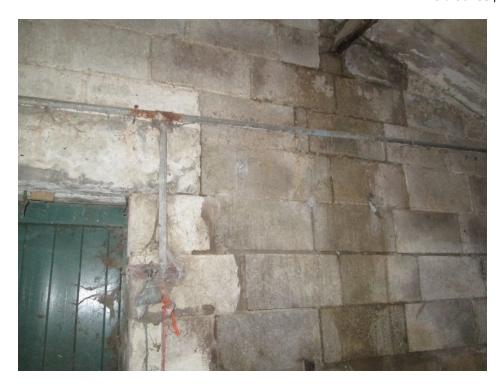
DAMAGED BLOCKWORK TO LEFT GABLE
